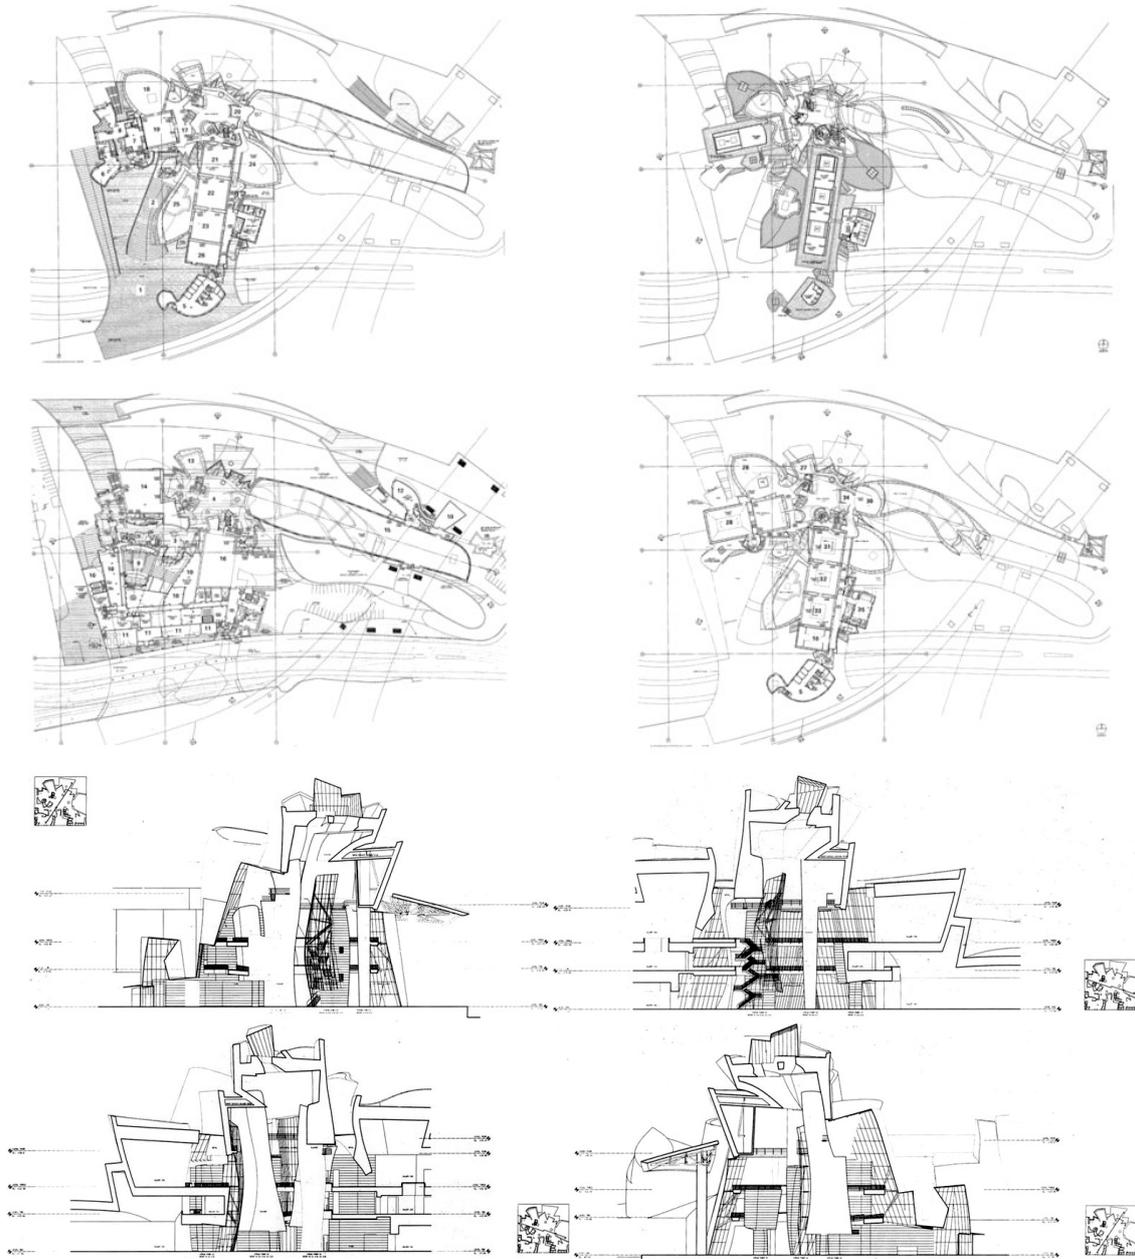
Floor Plans & Elevations by © Frank Gehry Architects.
